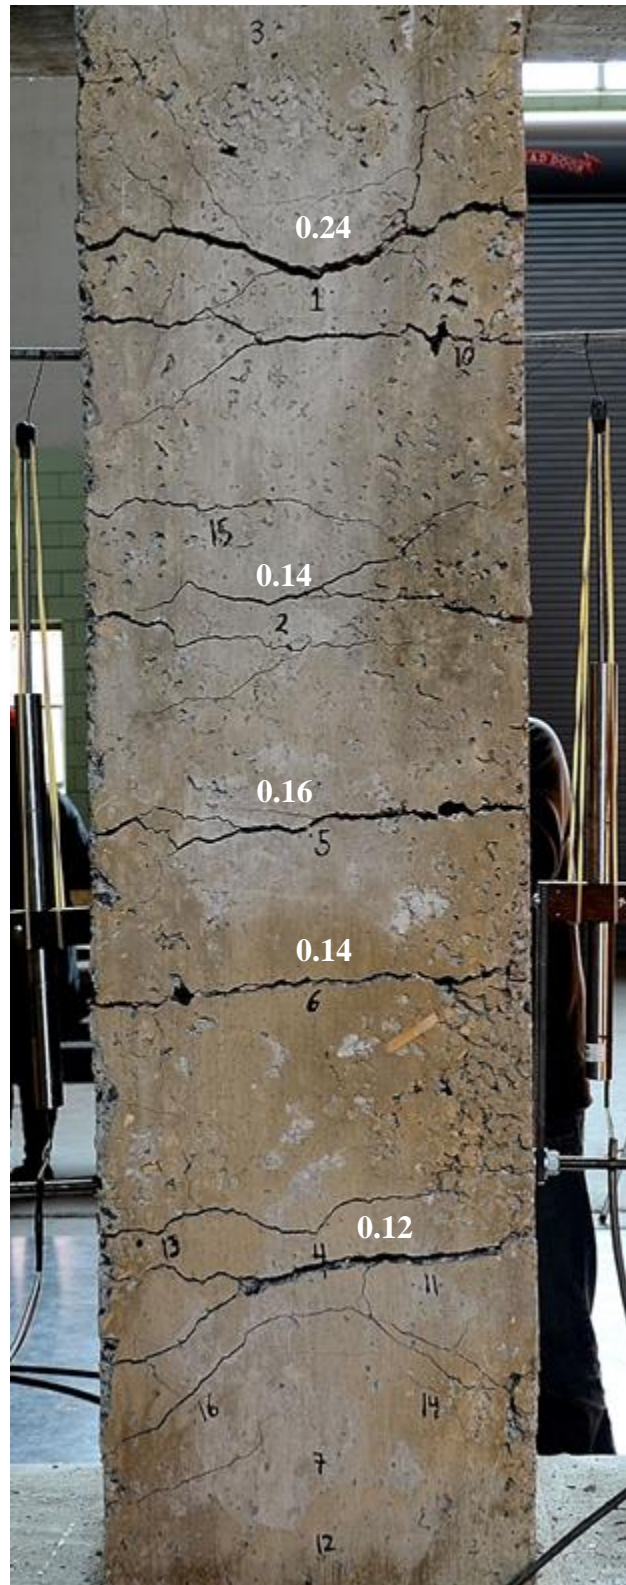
Cracks on east face of TS02 at Load Step 25
